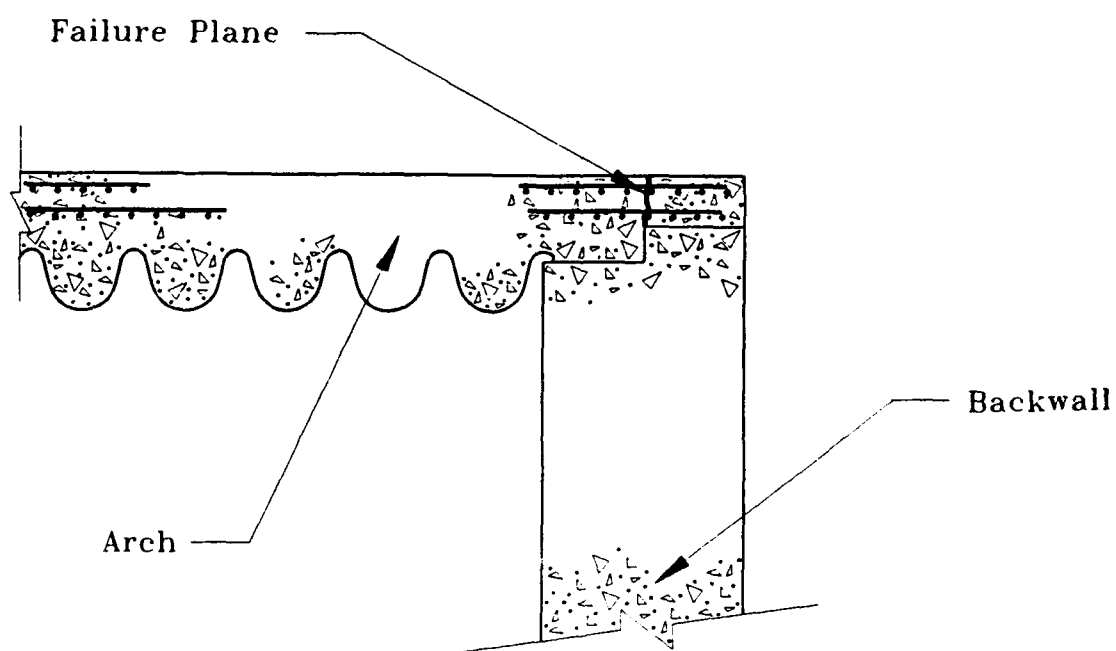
Section: Failure plane between the arch and backwall, PAS-3.
